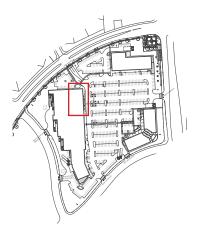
OUTDOOR SALES PLAN UNIVERSITY COMMONS - PHASE II
